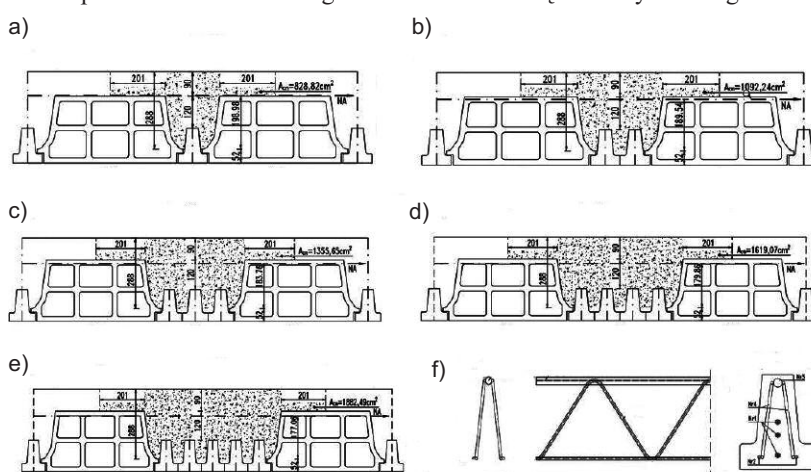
Rib cross-sections in a densely ribbed ceiling with a thickness of 34 cm. The rib consists of one to five prestressed concrete beams RS139 and concrete superstructure: a) rib with one RS139 beam; b) rib with two RS139 beams; c) Rib with three RS139 beams; d) Rib with four RS139 beams; e) Rib with five RS139 beams; f) cross-section through RS139 beam and stiffening truss in RS139 beam
